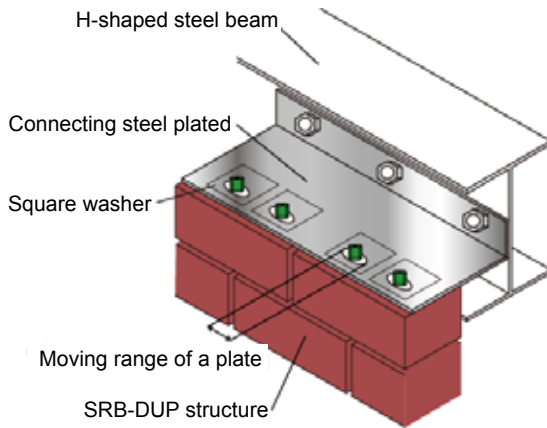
Overview of the Proposed Frictional Connecting Method between Wall and Frame (1)
